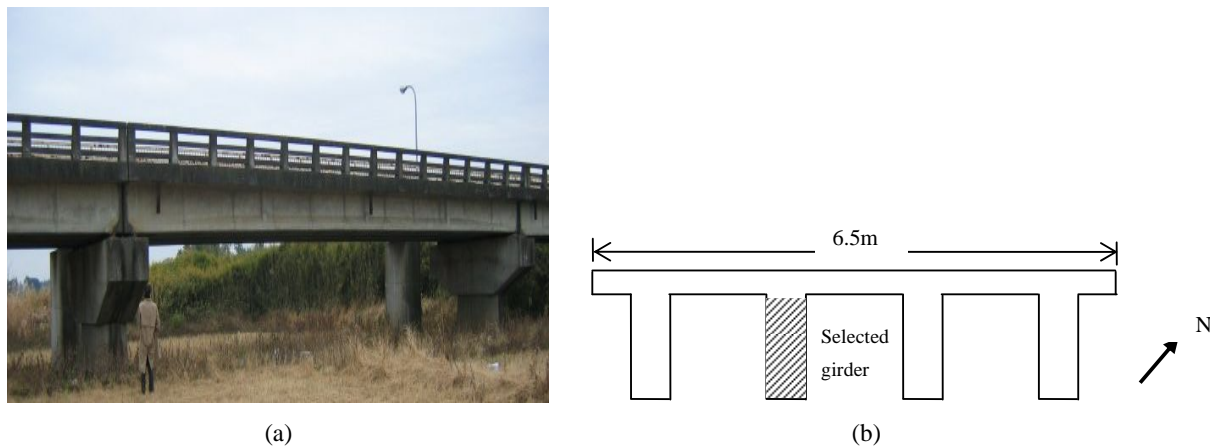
(a) A view of the Kawane Bridge (b) cross section of the bridge
